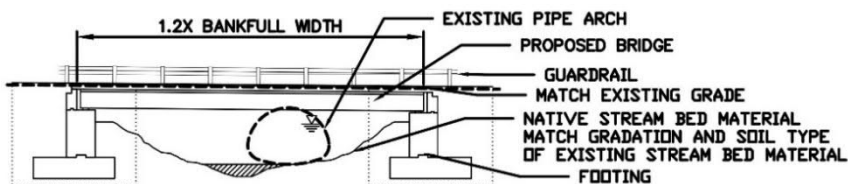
Typical detail of a bridge designed to meet the MA River and Stream Crossing Standards.
